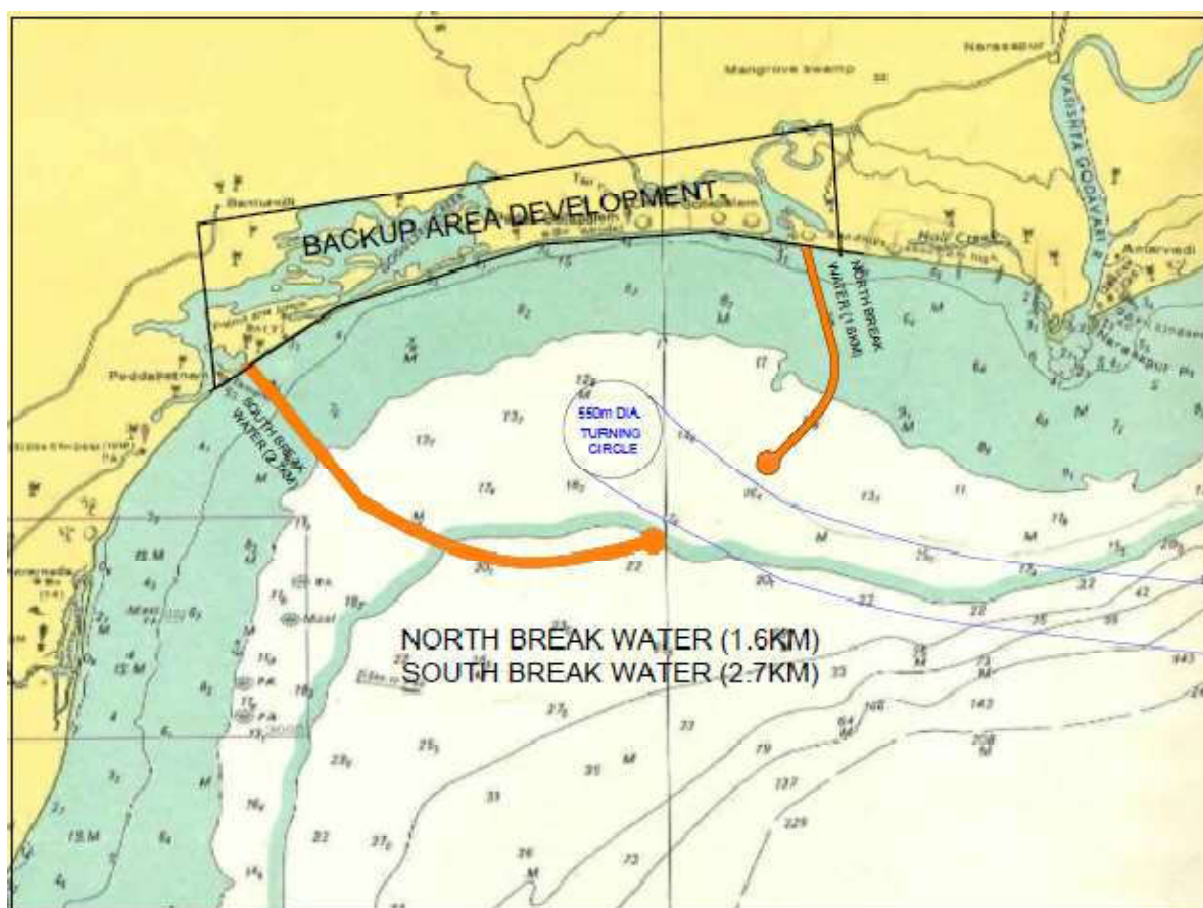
Port layout at Goguleru, 10 km north of Manginapudi (Alternate – 3)
